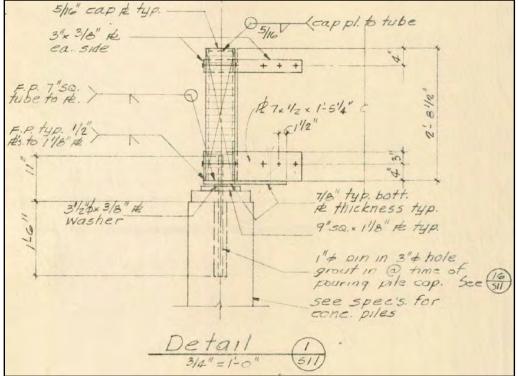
Pile to glulam connection detail from Pertinent Document 2.
